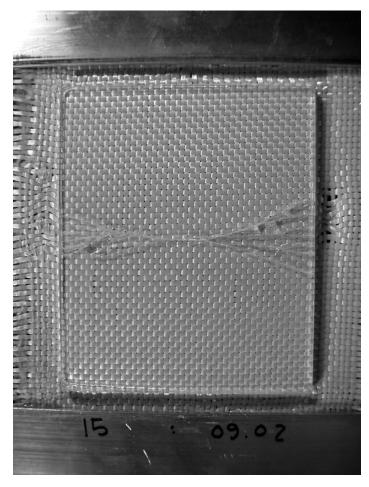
Specimen 15, side 1: Aramid textile/PVB interlayer Fracture pattern after failure
